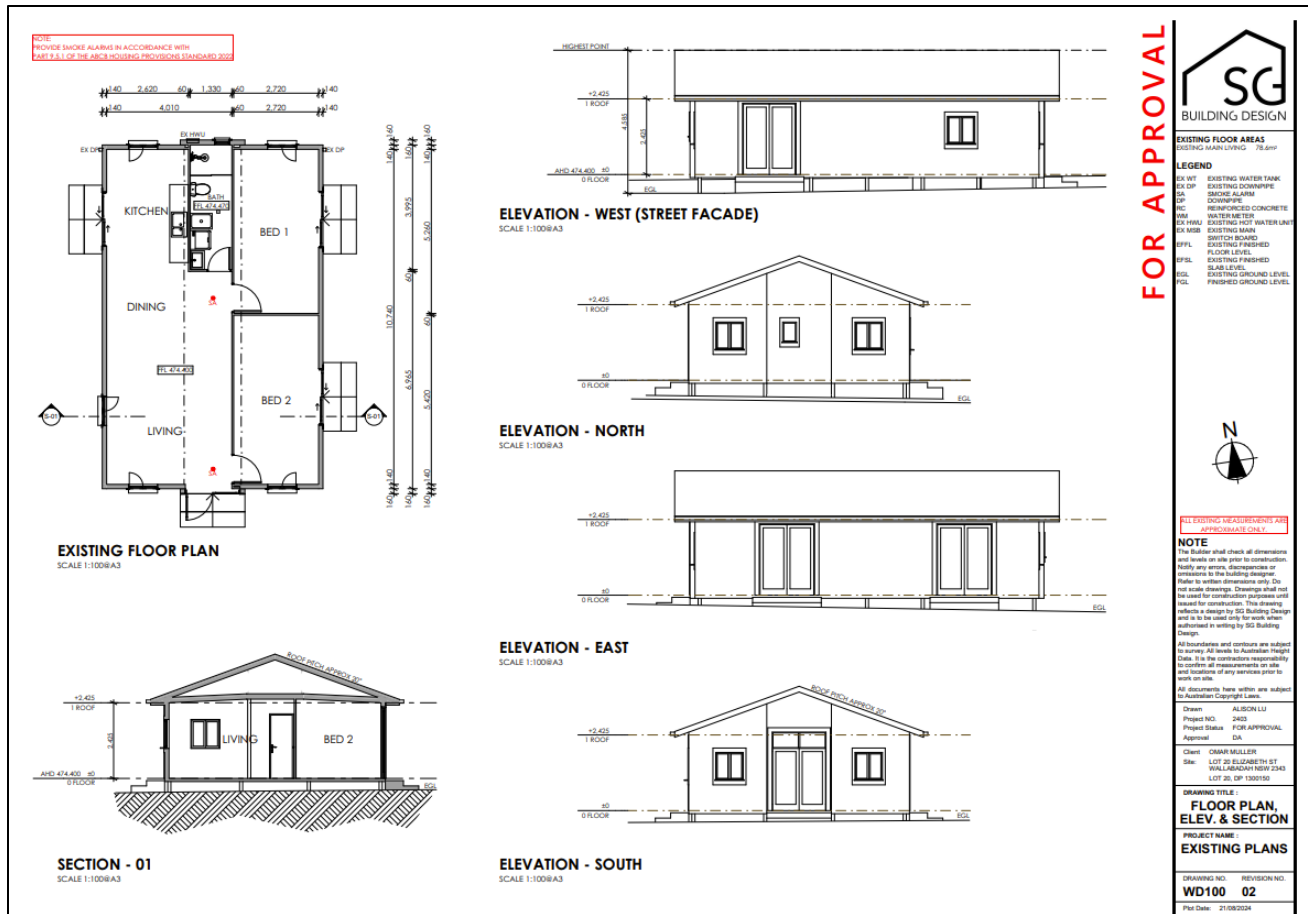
Architectural Plans (Source: SG BUILDING DESIGN)
